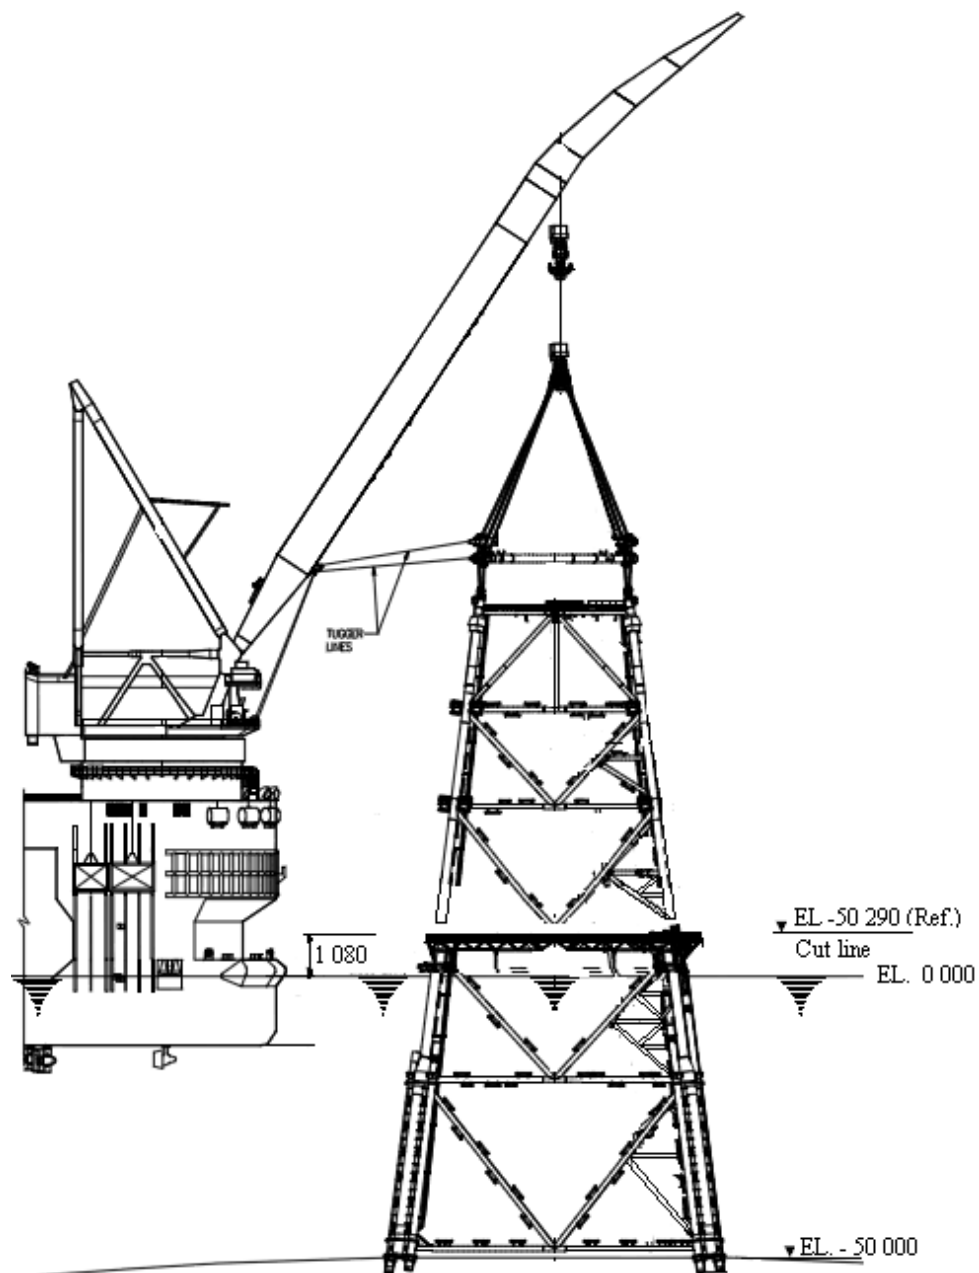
Jacket upper section – Inshore lift-off from lower section
